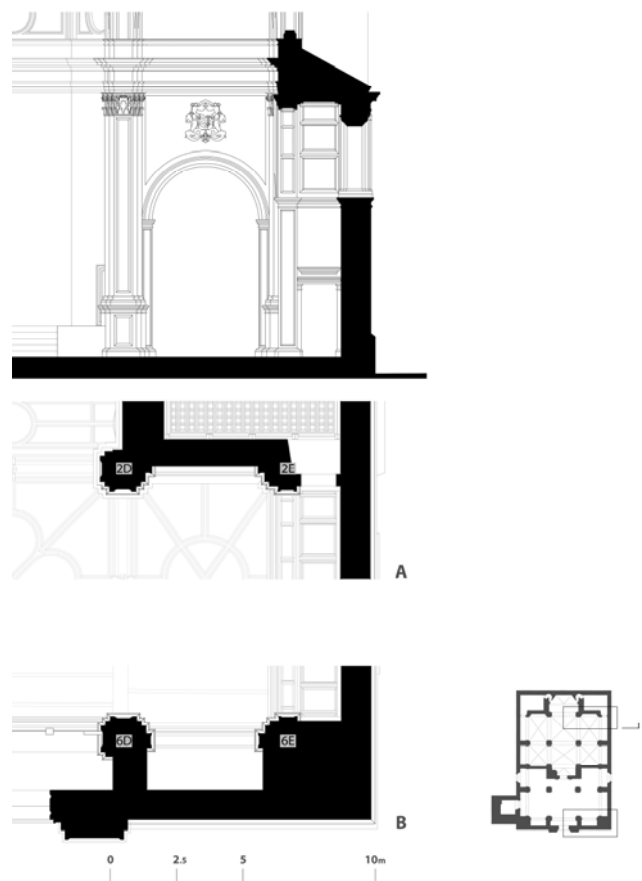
Architectural orders: (a) elevation and floor plan of the chancel section and (b) section at the foot of the church. Author's own.
